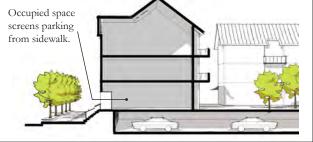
Where enclosed parking is at ground level, it should be fronted or wrapped with uses that can be occupied such as lobbies and living space when possible.
